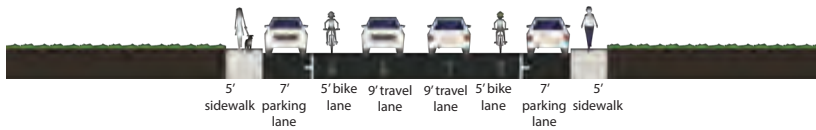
Plum Street, City Park Avenue and Constitution Avenue Existing Cross Sections
